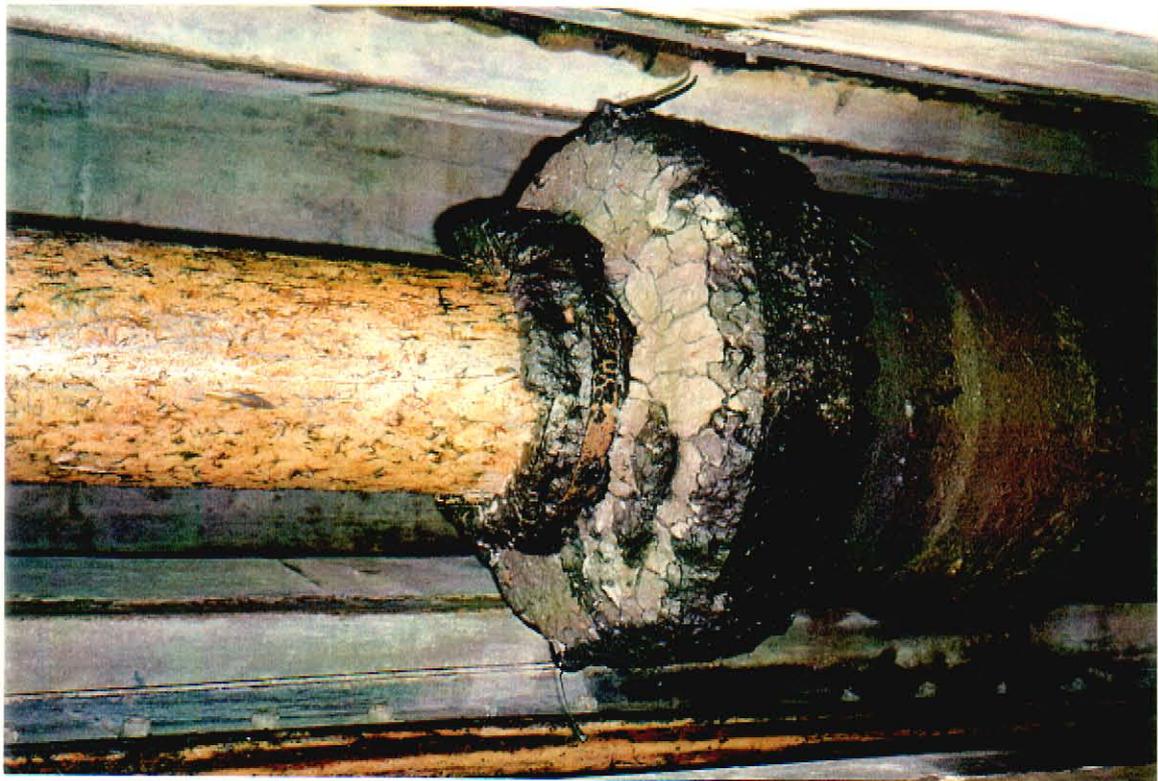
Hydraulic Piping Inside in East Abutment Cylinder Well
